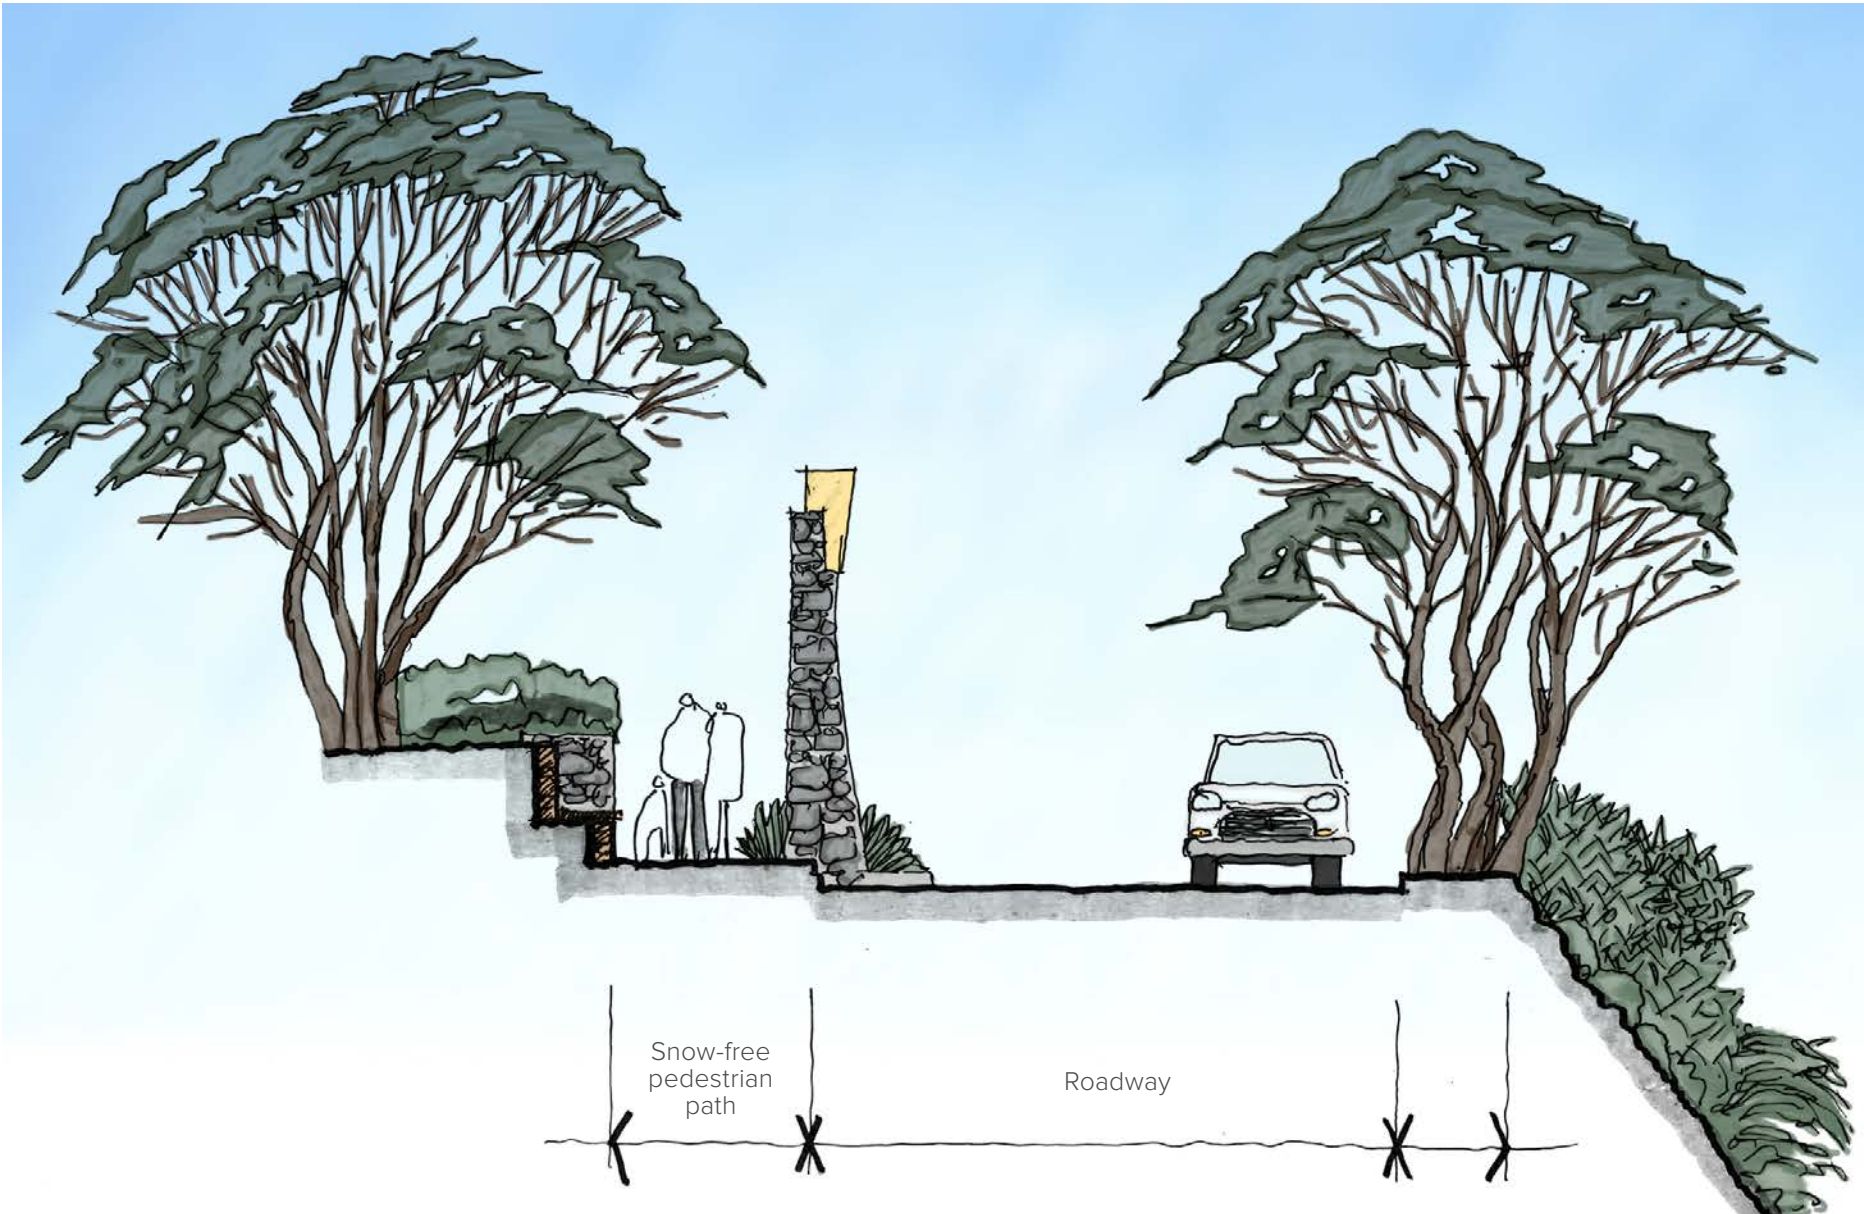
TYPICAL 'VILLAGE WALK' SECTION
